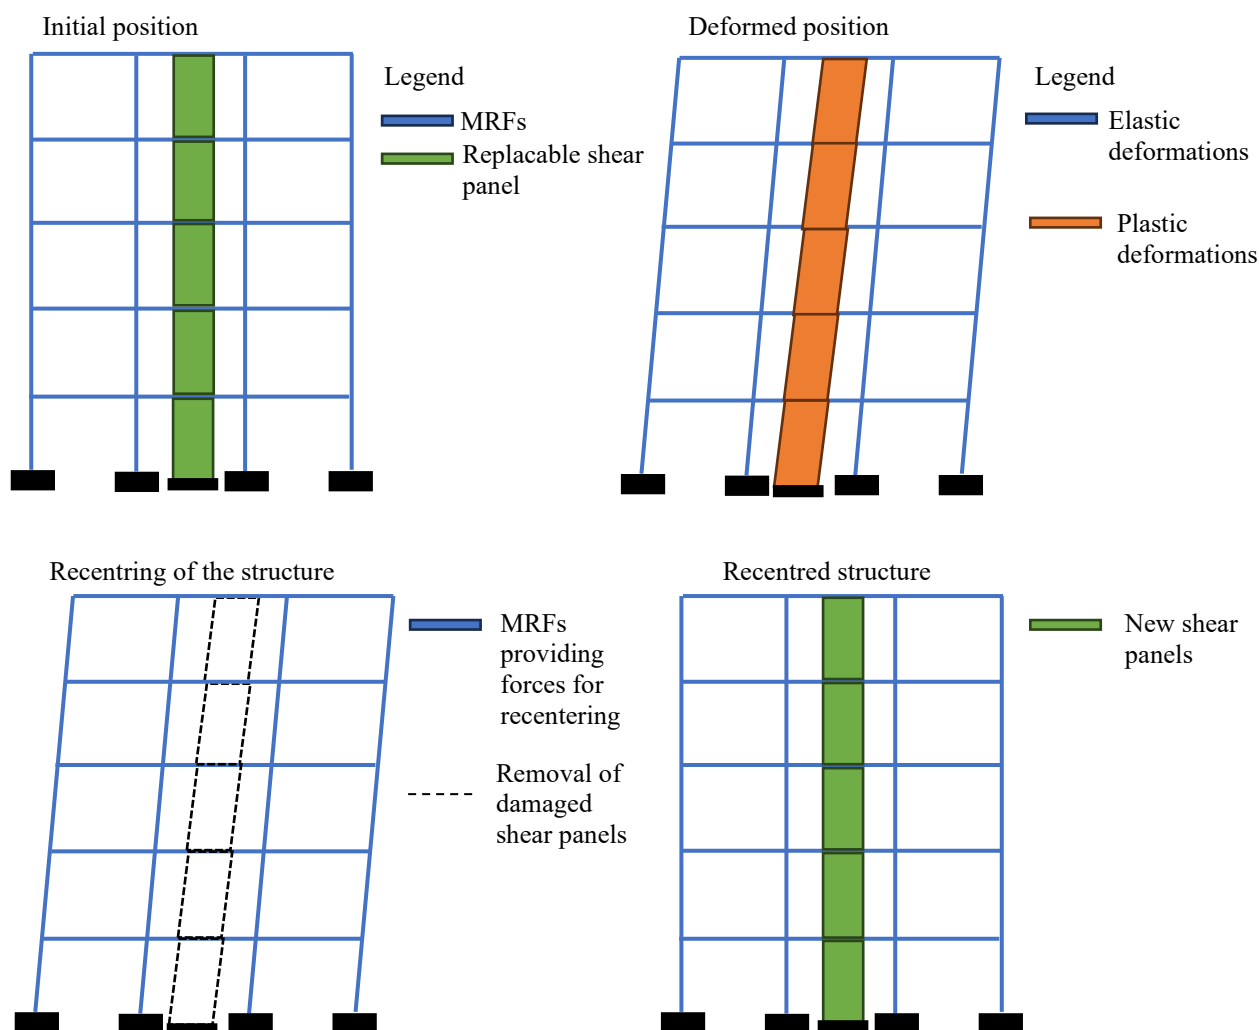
Building elevation and schematic view of the structure's re-centering capability
